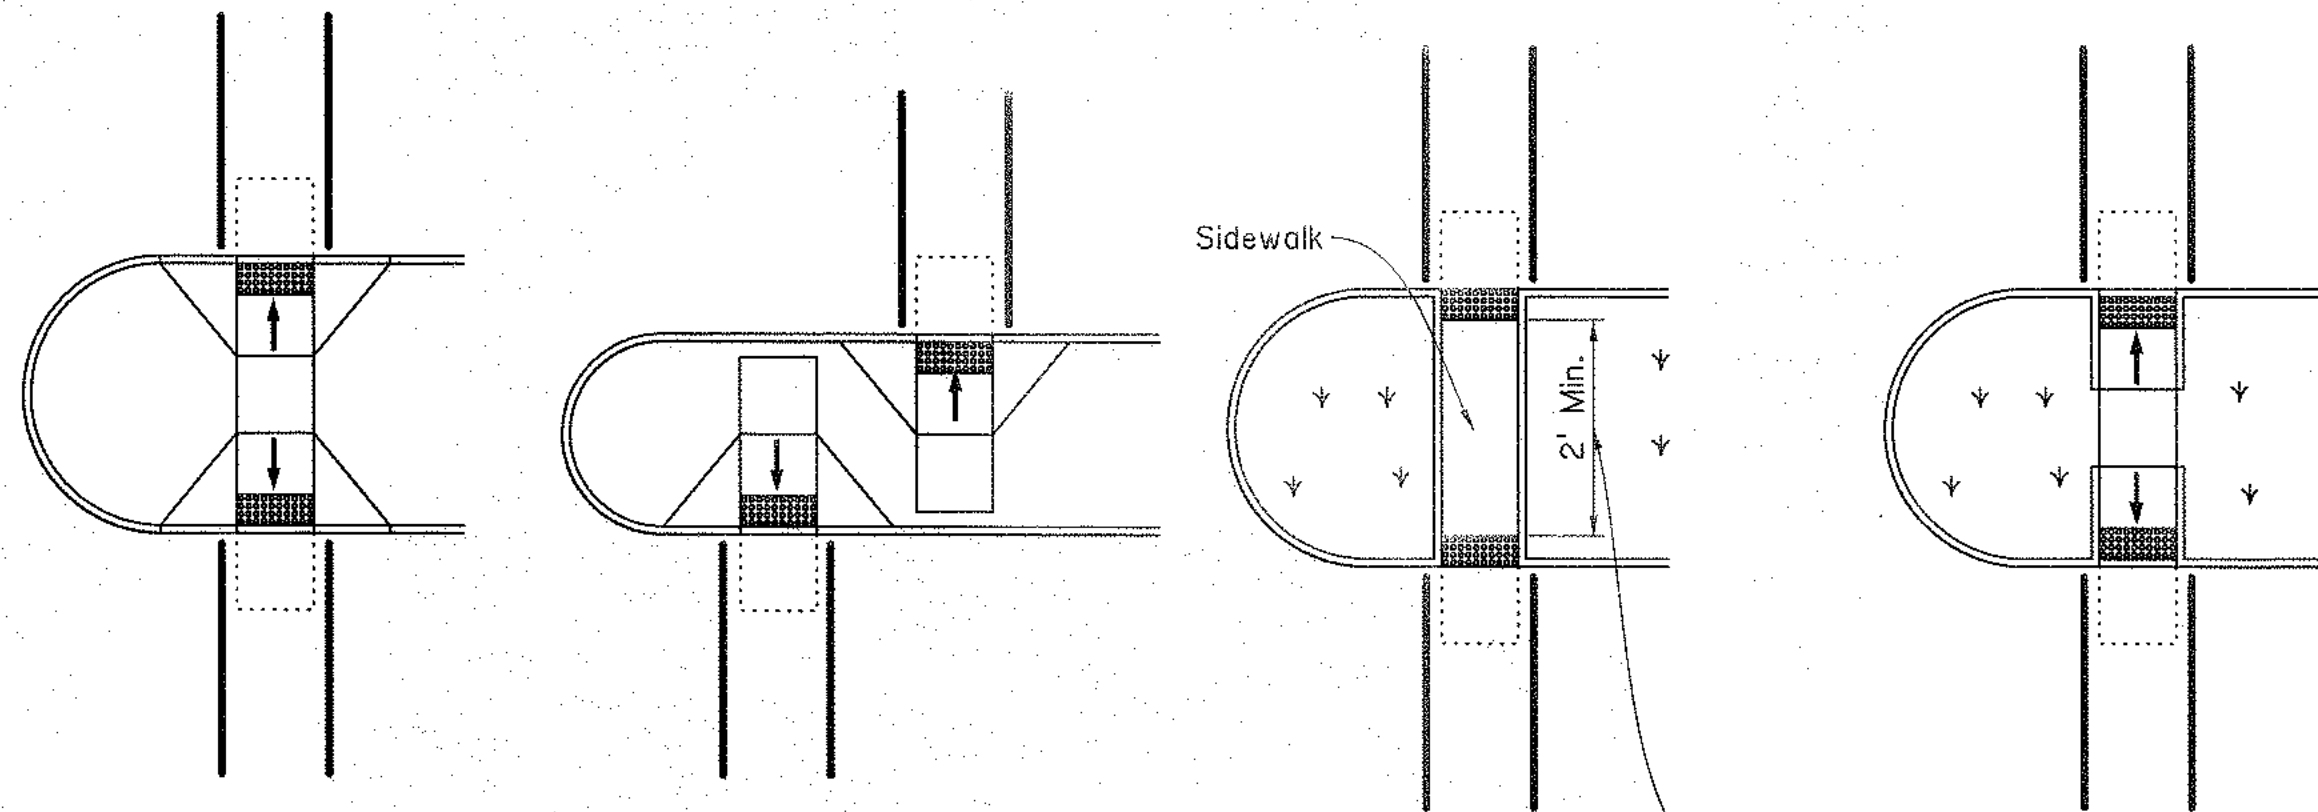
DETAIL E: CURB RAMPS PLACED AT MID-BLOCK CROSSING
